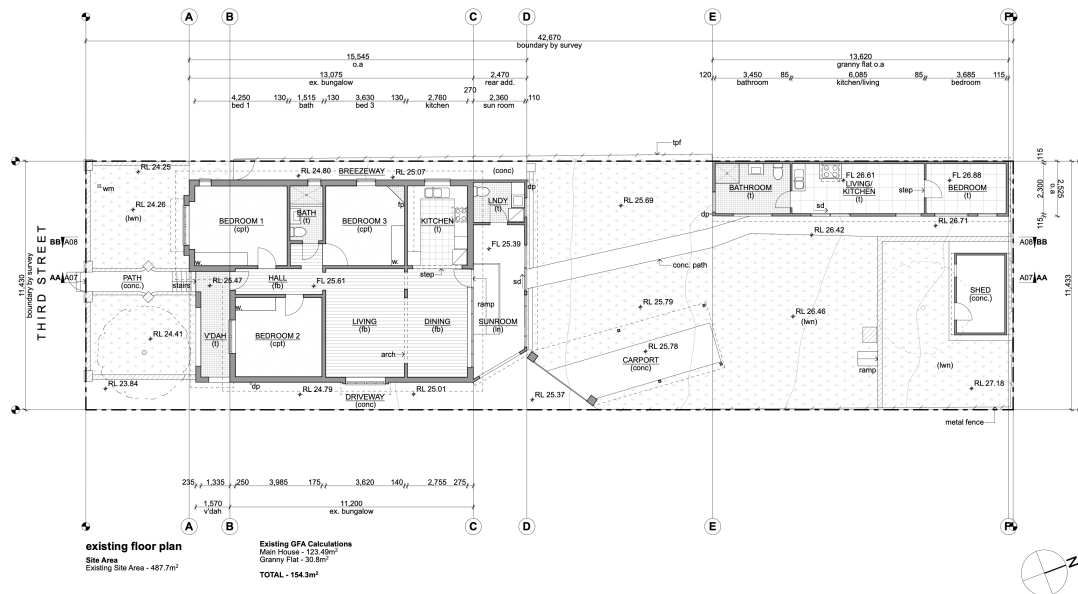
Existing Ground Floor Plan (Source: SWAD) - Not to Scale
